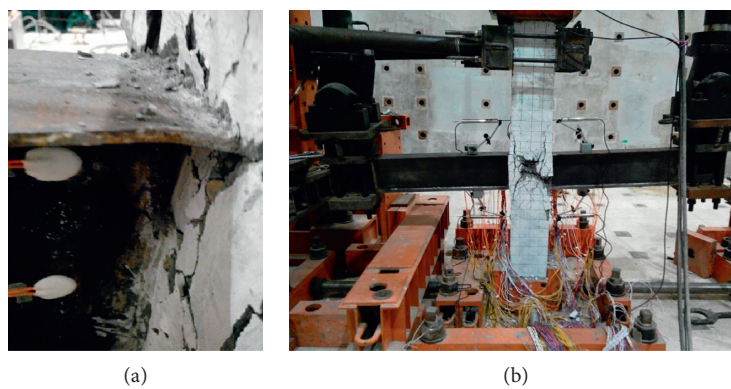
Failure modes of SRC-4. (a) Top flange buckling of beam. (b) Final failure mode.
